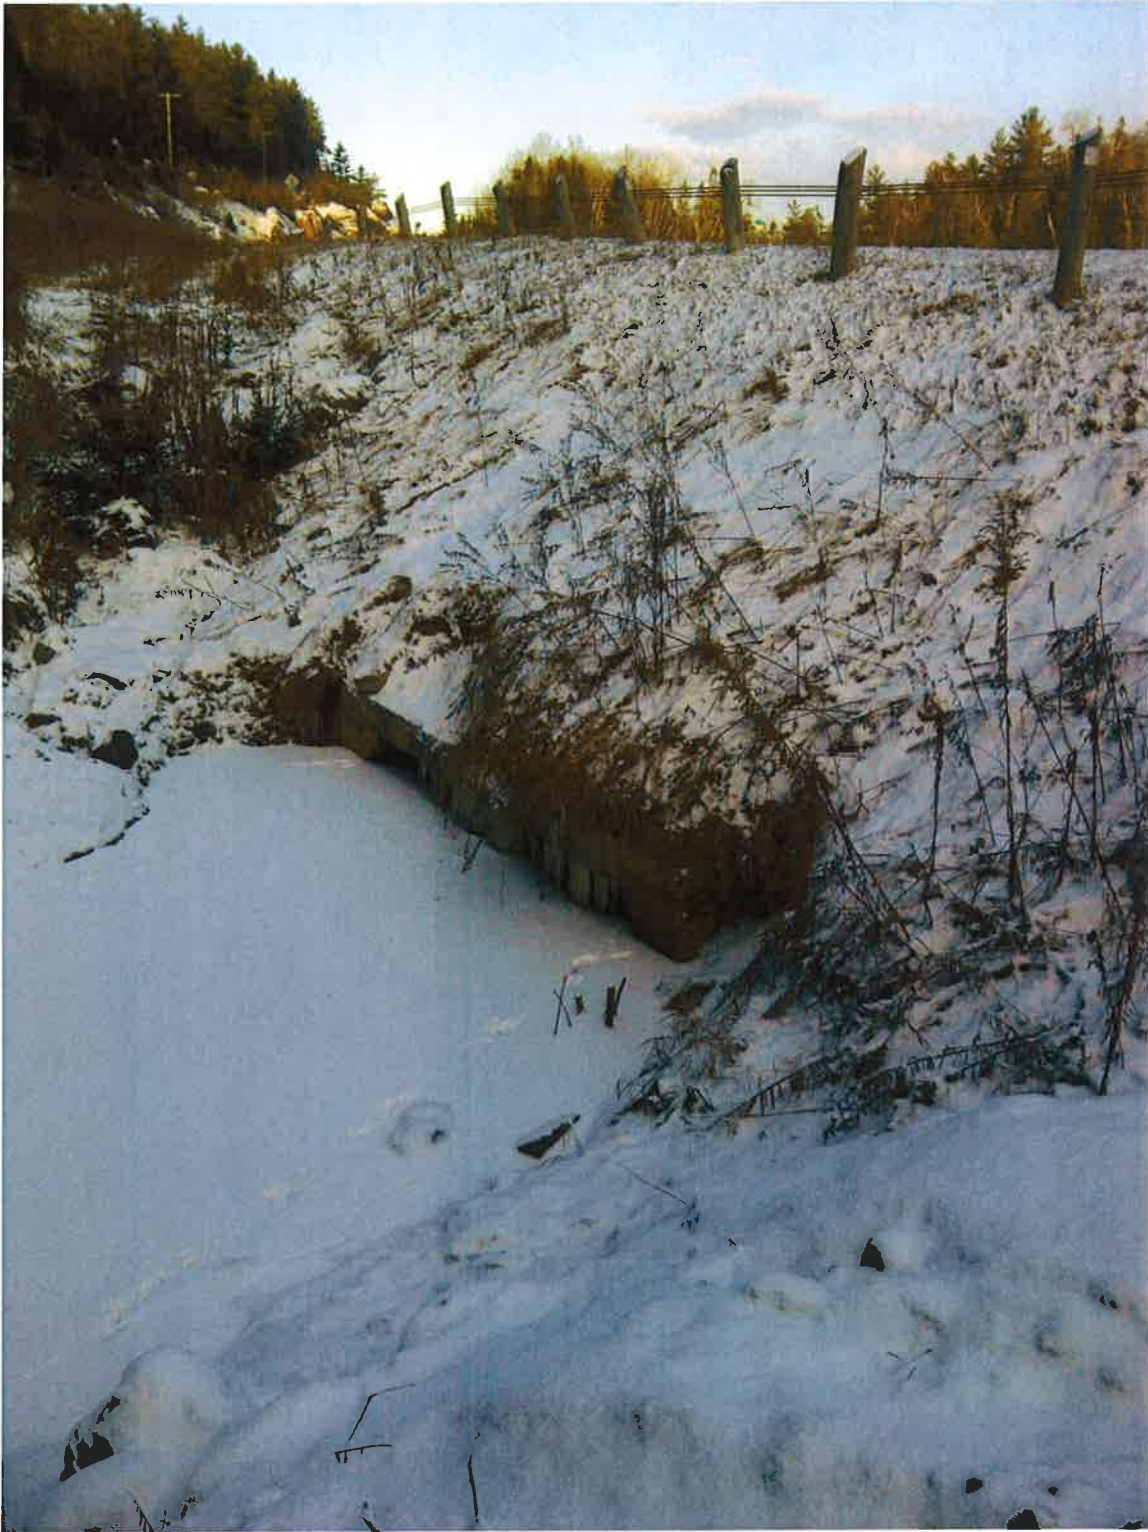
Highway 11 West Embankment Slope at Robin Creek Culvert (looking northeast at culvert outlet)
